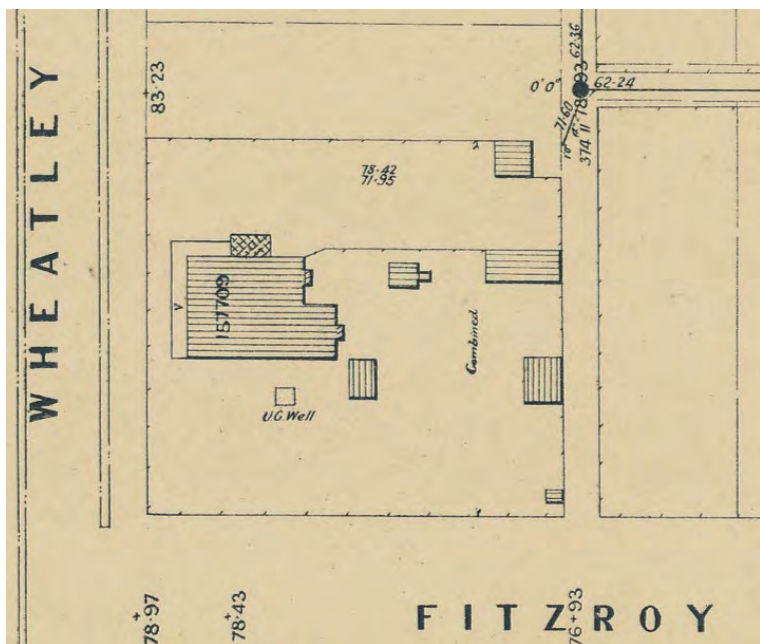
Footprint of the house and its outbuildings, 1926 (Source: MMBW DP 2838, dated 1926).
